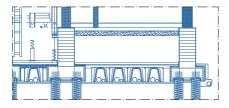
Additional foundation projections on plan 1:1000 & detail of pile cap foundations of the tower 1:50 $\,$
